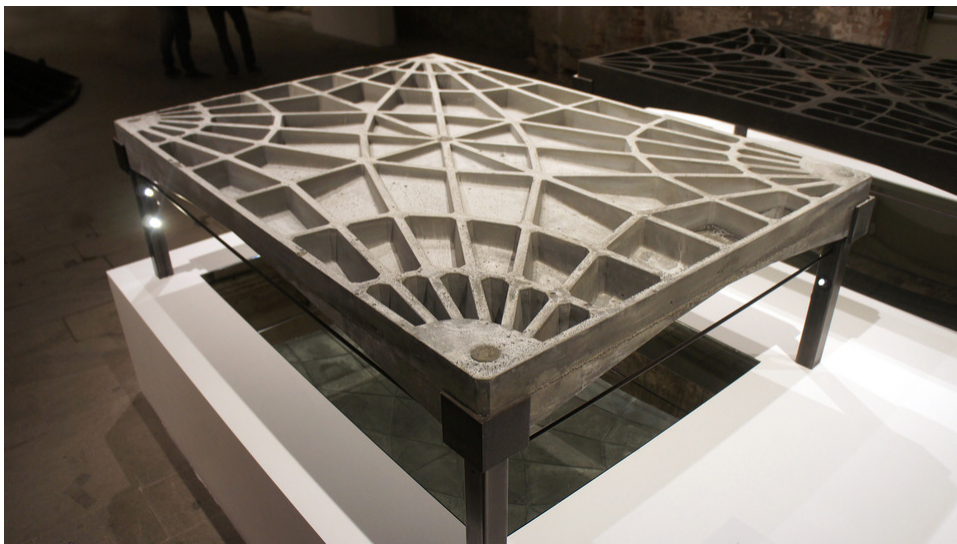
Prototype ribbed UHPC floor slab, ETH Zurich
